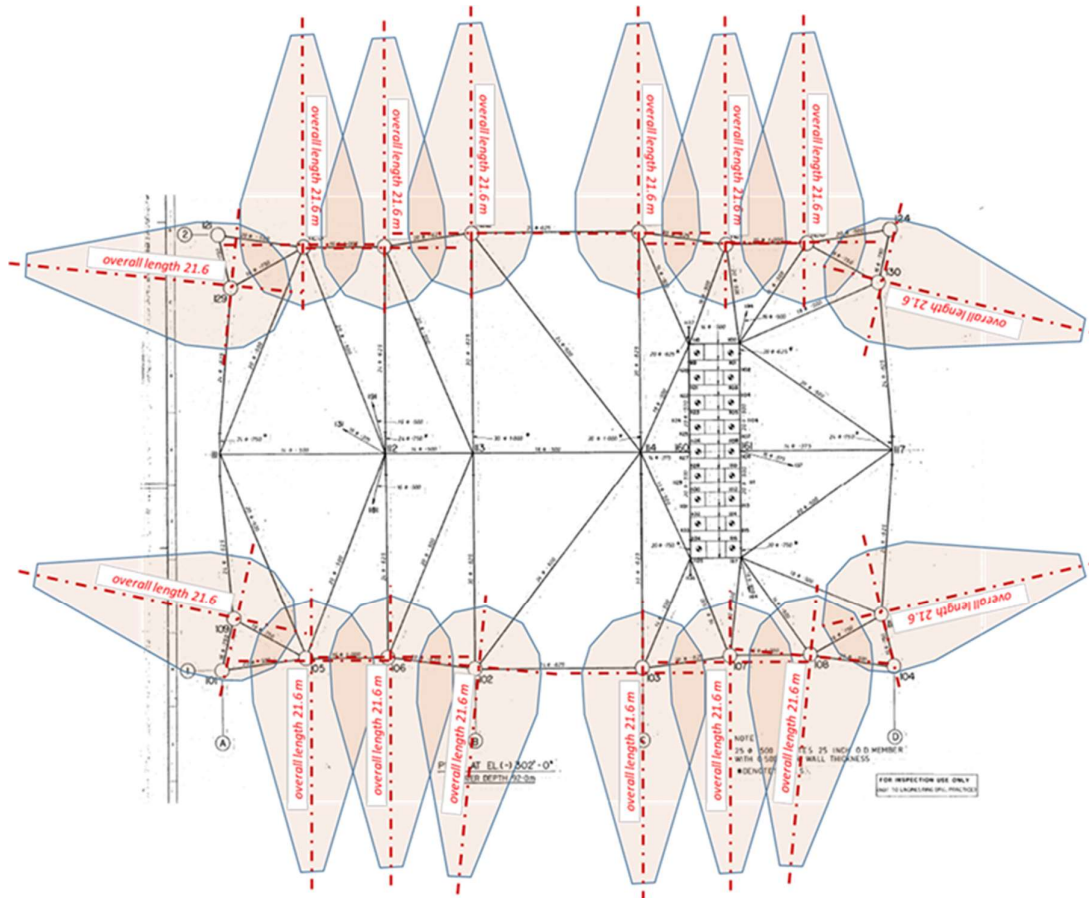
Plan view of Mackerel platform indicative dredging arrangement for external pile cutting
